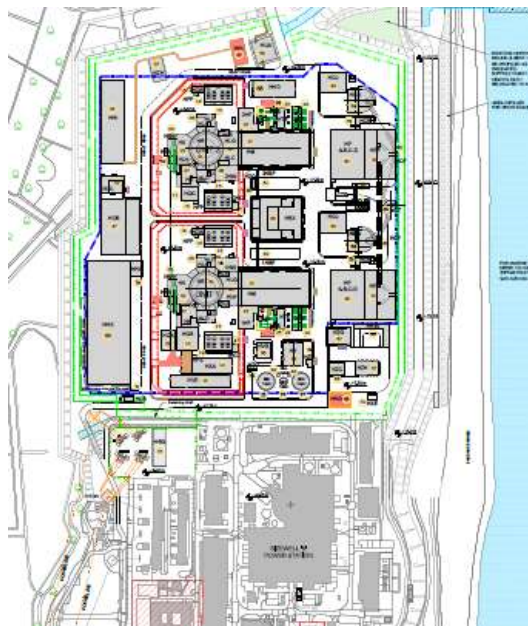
Site Layout (Outer Green line shows NSL Boundary).
